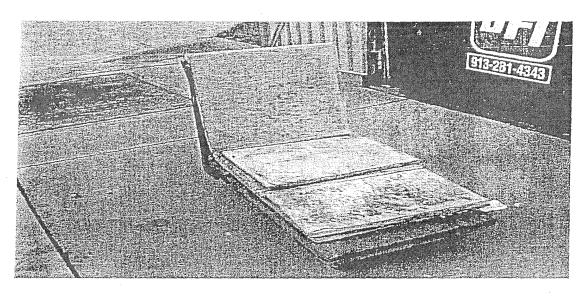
Moldy Construction Debris found in 11th Floor Outer Ring, Back of the West wall of 11TS5.
